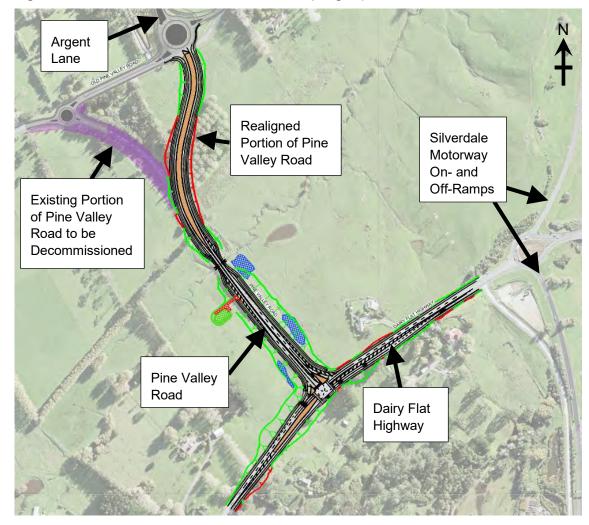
Location Plan and Extent of Works (Stage 1)
